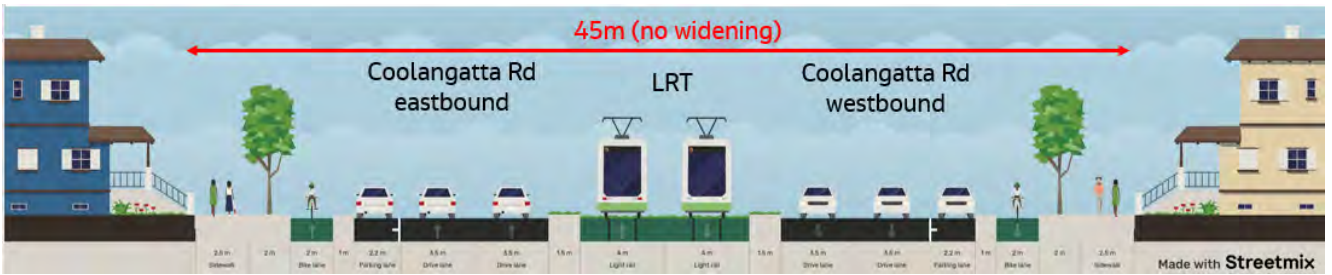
Coolangatta Road – Alignment K3/ K4 indicative cross section
